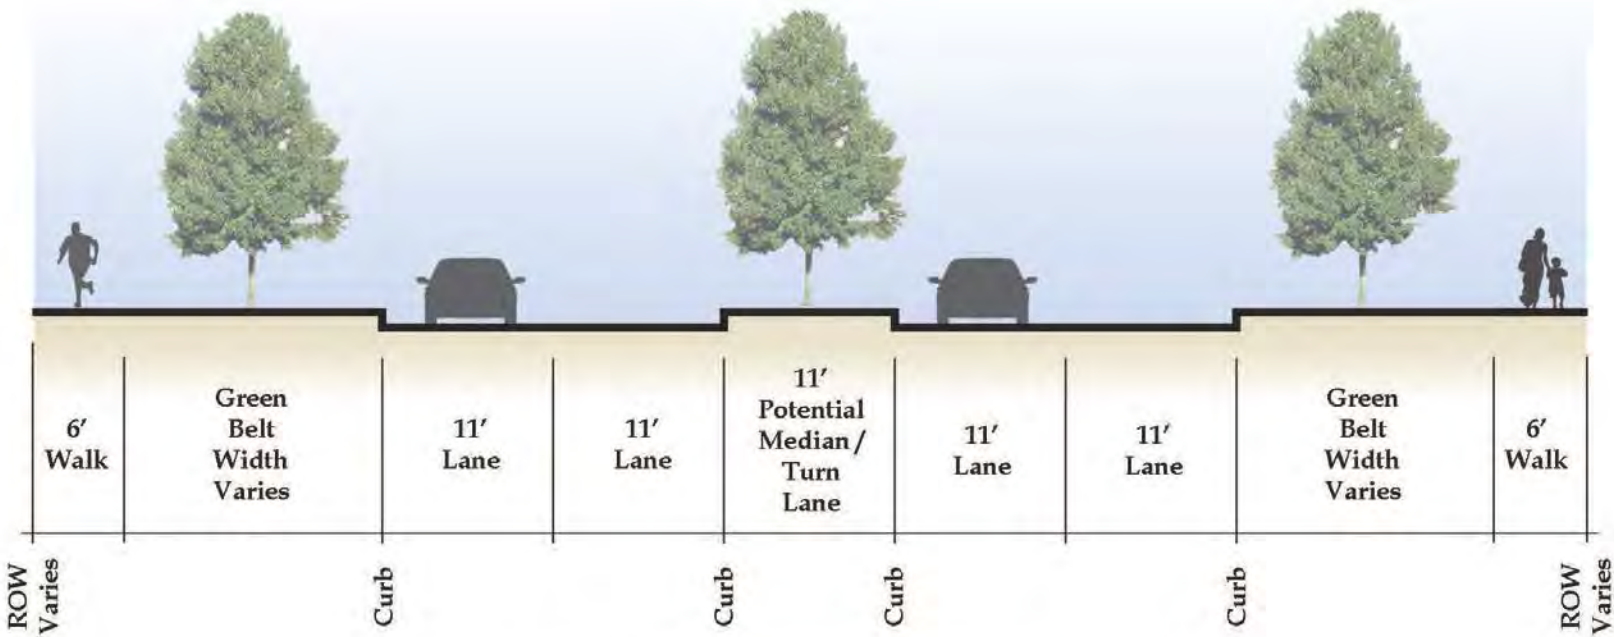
Illustration K. Proposed US-10 Cross Section – Jackson Road to Dennis Road
